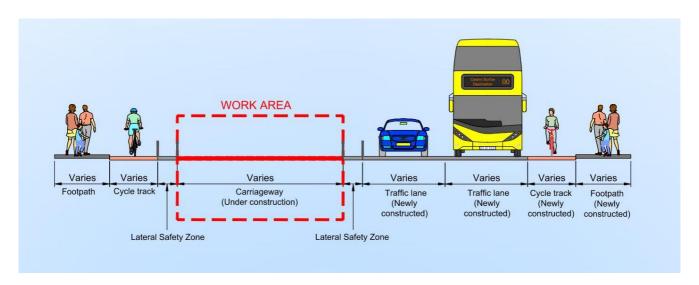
Traffic Management Cross Section, Section 2 - Stage 4
